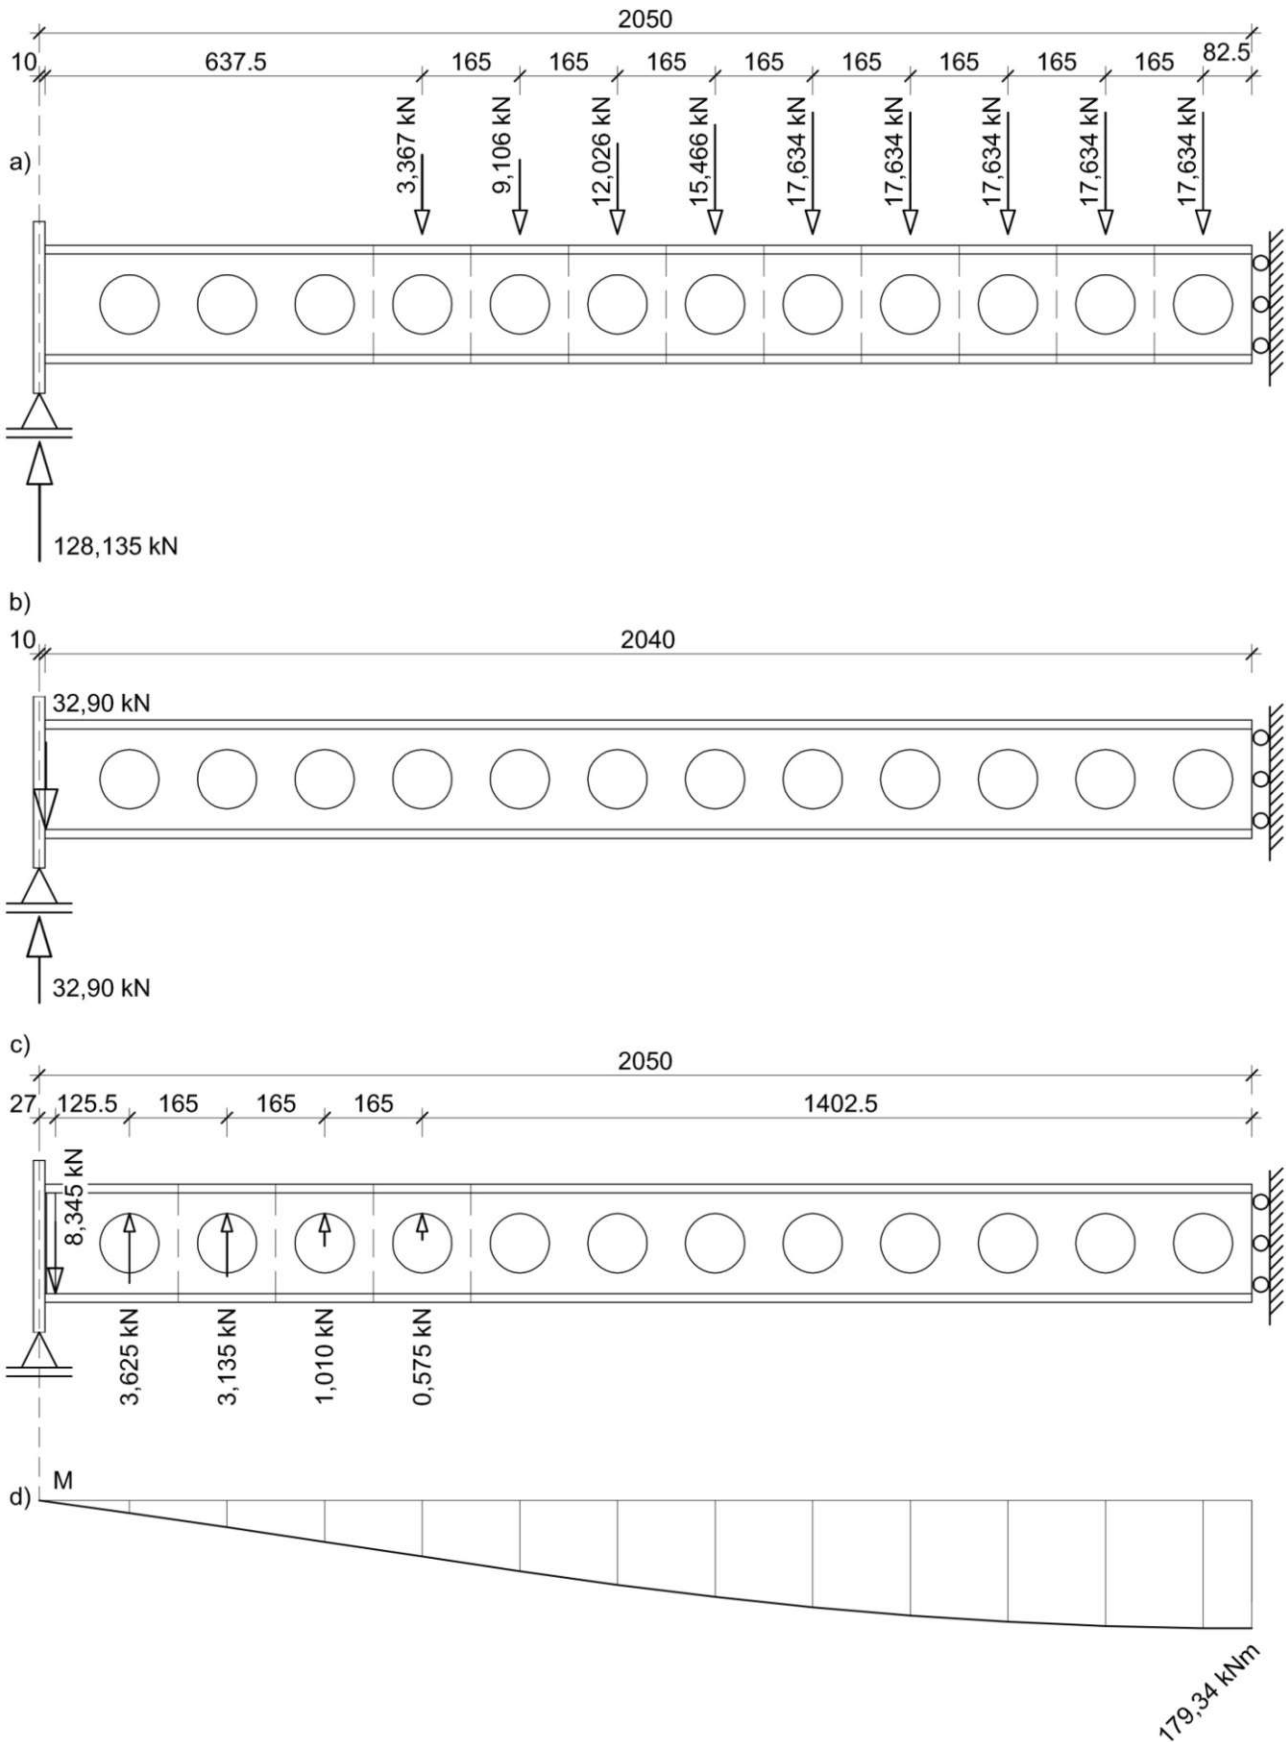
Model design for the steel structures of the SCSC plate: a) the external loading on the model; b) loading from the concrete pressures next to the end plate; c) effects from the load transfer between one outside shear connector and the support on the steel structure; d) bending moment diagram due to the loads illustrated in figures (a), (b) and (c). The forces in figure (c) are doubled for the bending moment calculation as two outside shear connectors are designed in the model.
